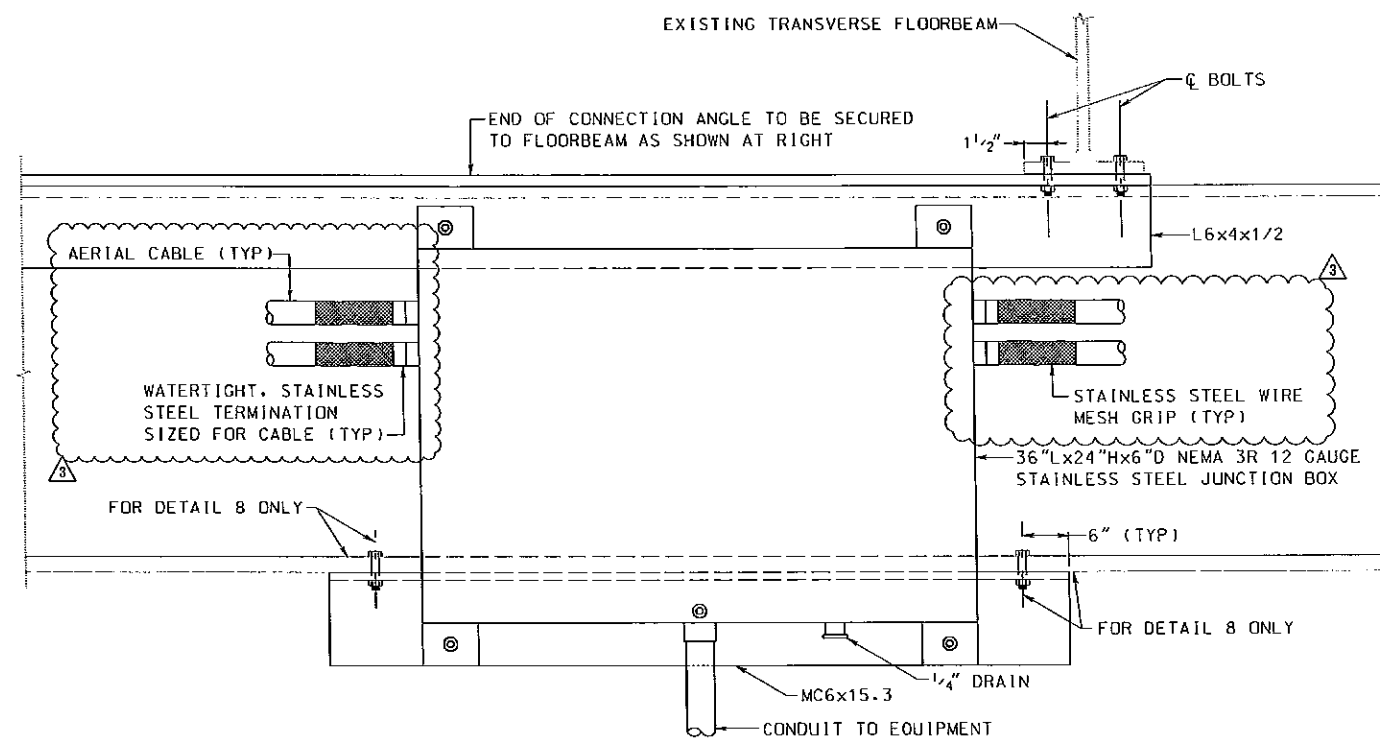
JUNCTION BOX ATTACHMENT TO TRUSS SECTION OF THE NMB
